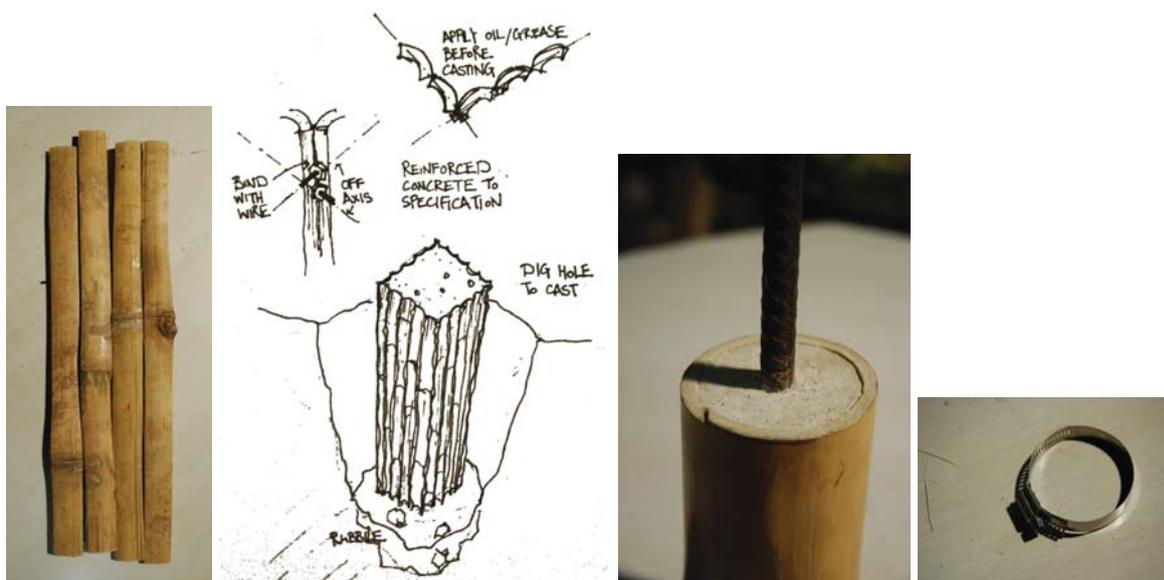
Split Culms Fig 6.8 Split Culm Formwork Concrete Fig 6.9 Injected Mortar Rebar Fig 6.10 Steel Clamp
